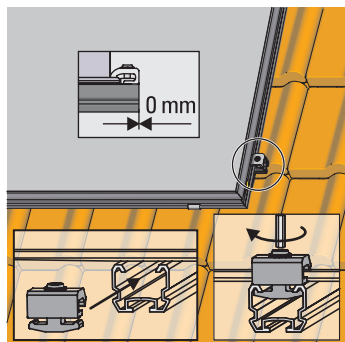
Check correct mounting position, slide the individual clamping block into the mounting profile and screw down tightly
